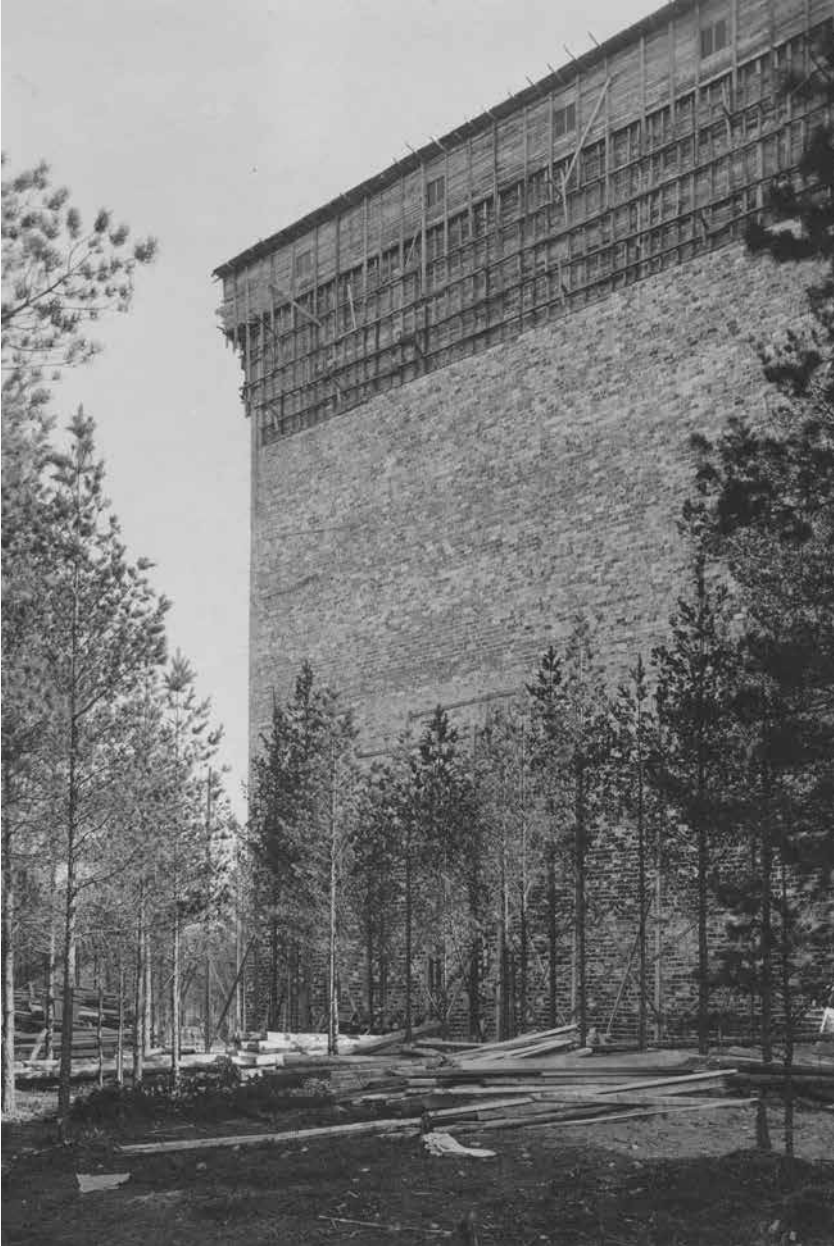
The wall of the sundeck was cast against a layer of bricks placed in the formwork. The wall was built using the slip forming technique. Photo PSA.
